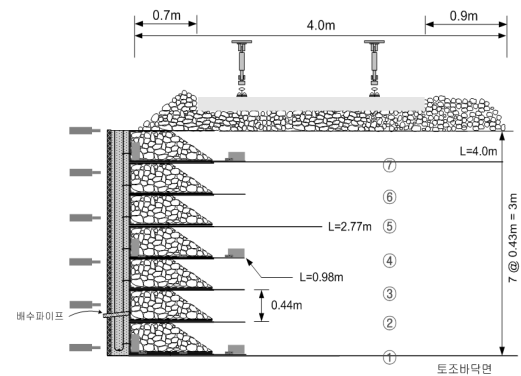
Procedures to construct reinforced subgrade with rigid wall
